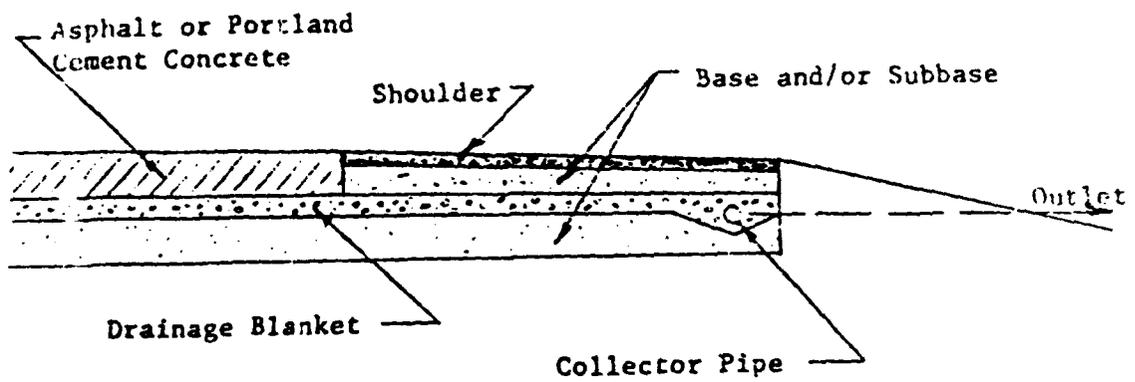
Examples of Types of Trench Subdrains (Ref. 23).
